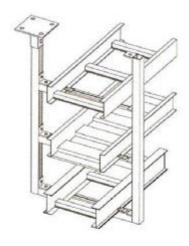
E TYPICAL STRUT SUPPORT INSTALLATION
